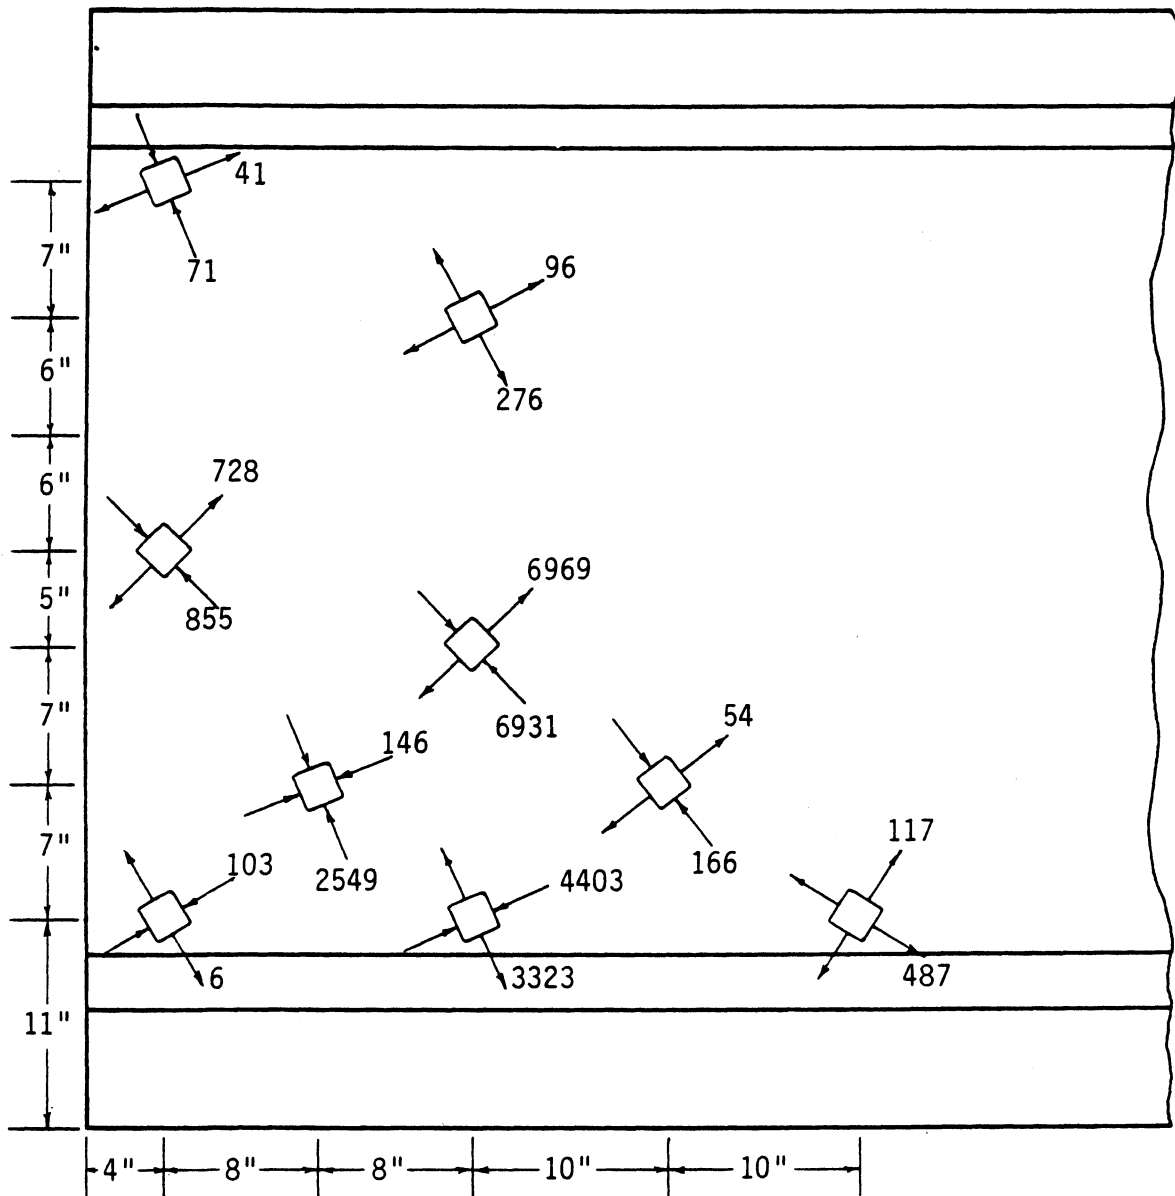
Principal stresses (psi) due to the addition of the concrete roadway slab.
